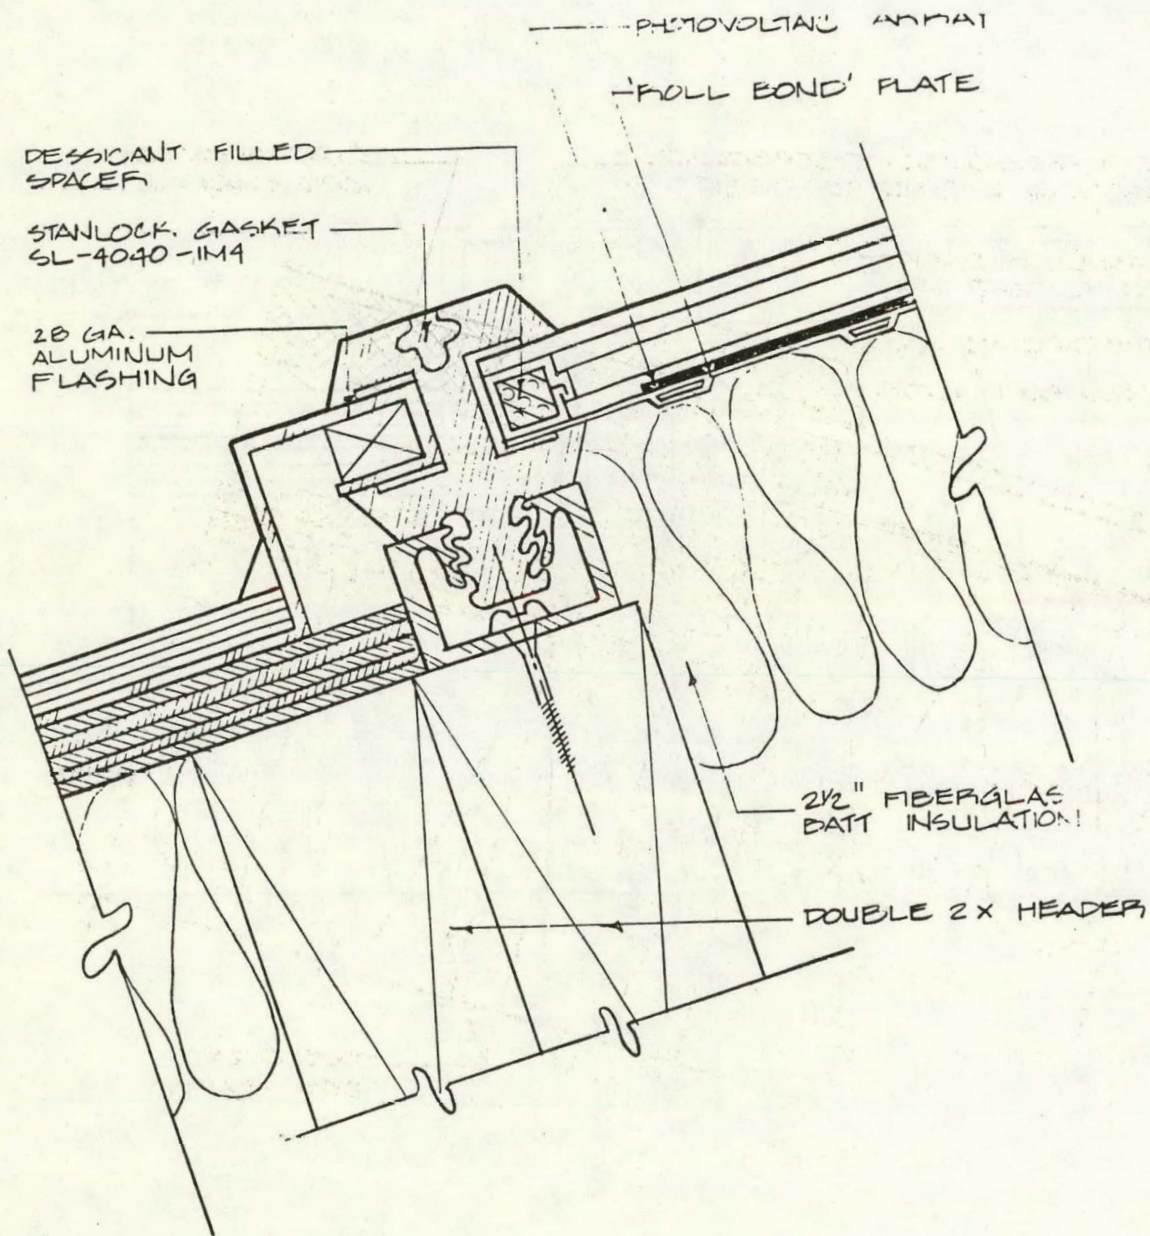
RPS proposed collector framing section at bottom edge
